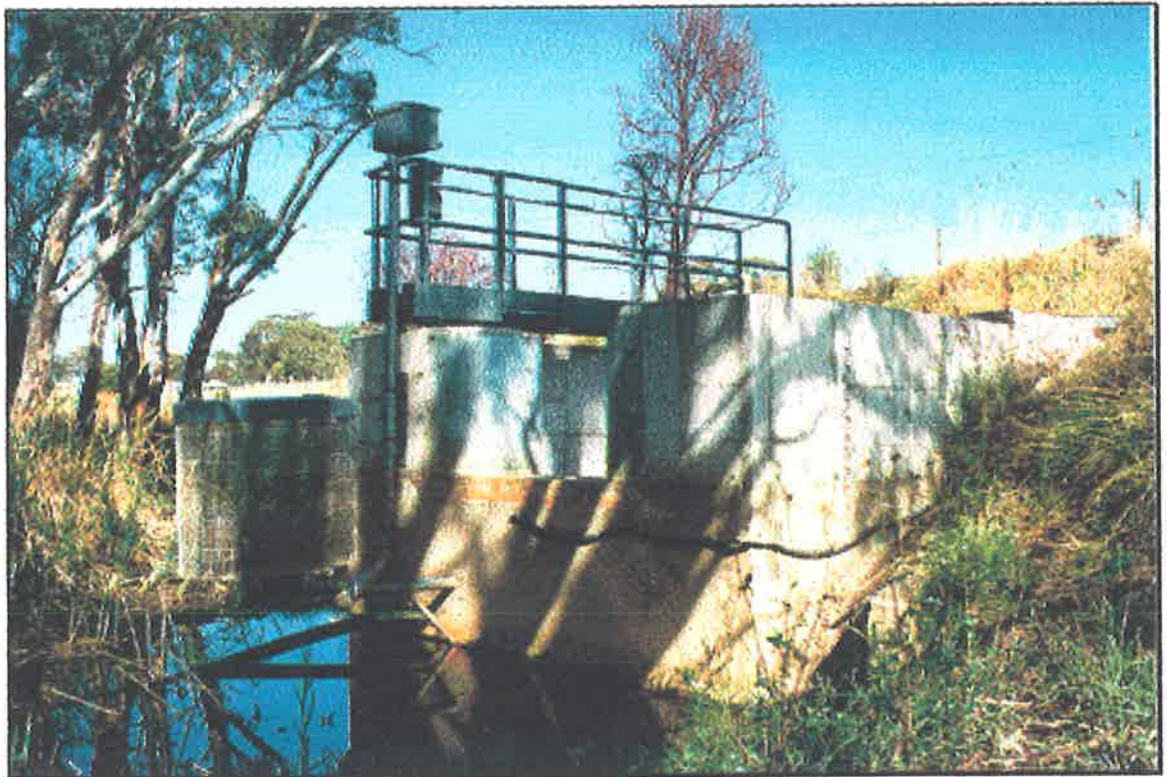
Outlet station, instrument protective housing and intake hose
